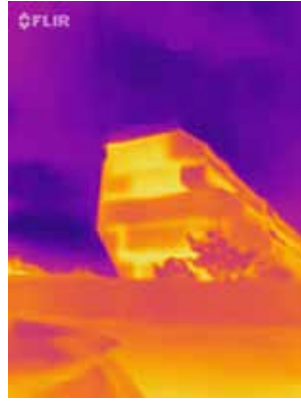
The western end wall of block A illustrating heat loss from the dwellings and significant thermal bridges at the floor and wall junctions.
